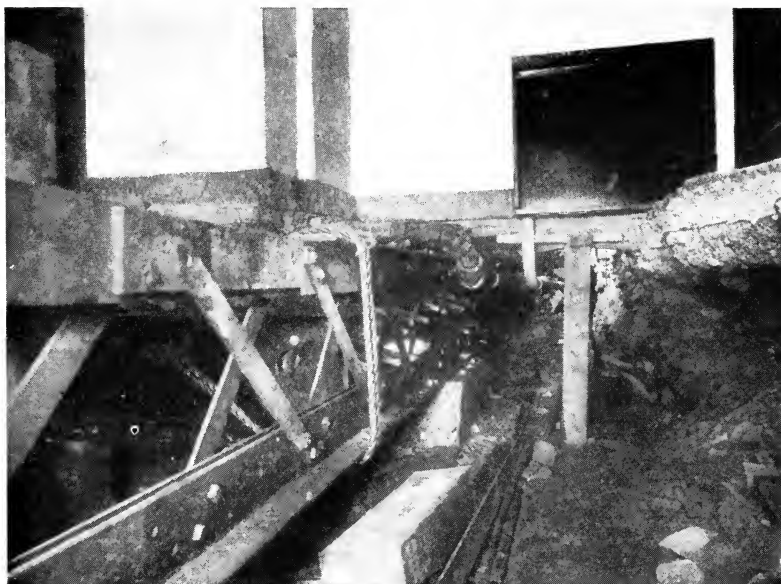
Showing the Use of Lattice Girders for Grillage Purposes before Concreting
